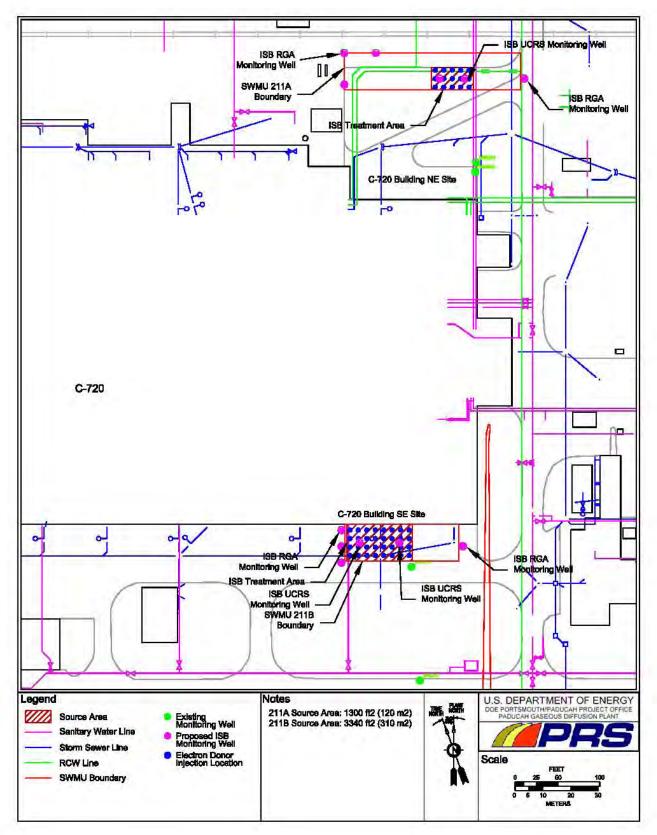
Plan View of Alternative 2 at C-720 Northeast and Southeast Sites
